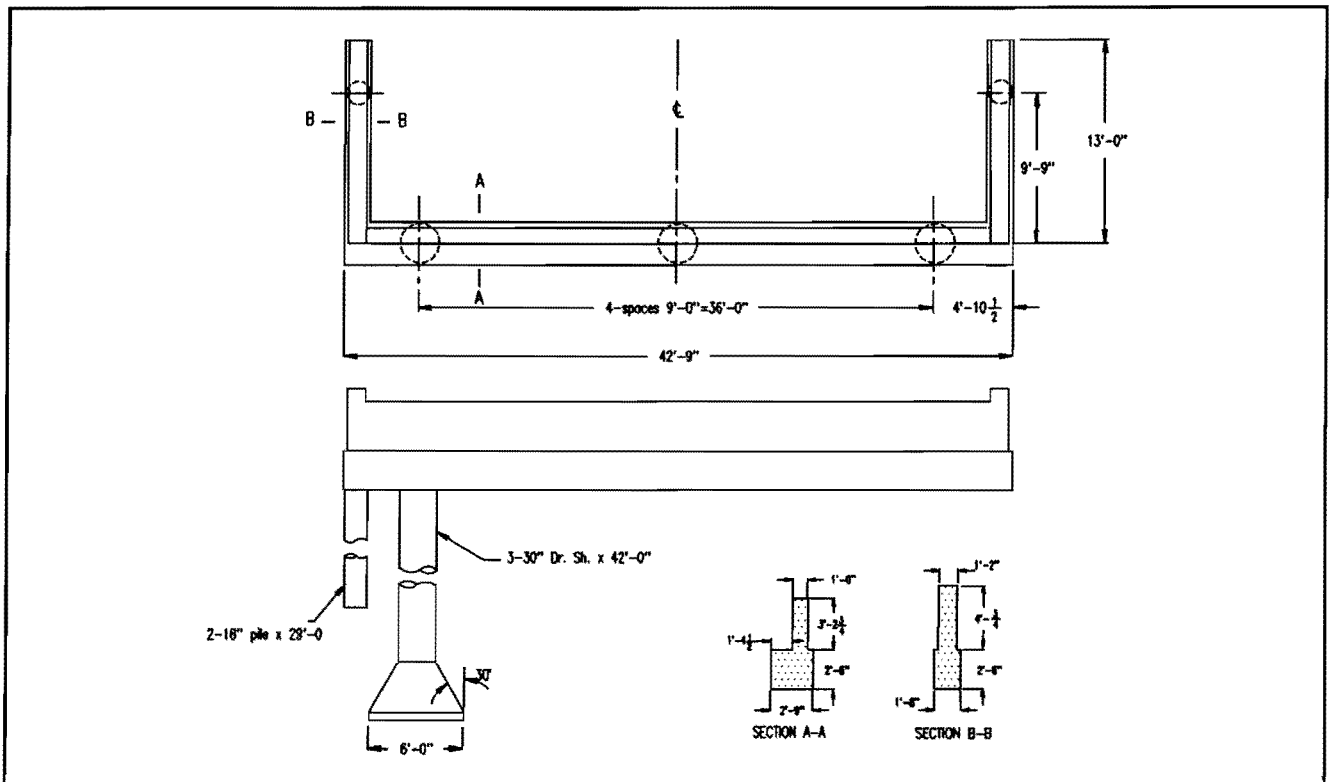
Design Details for Representative Reinforced Concrete Abutment
